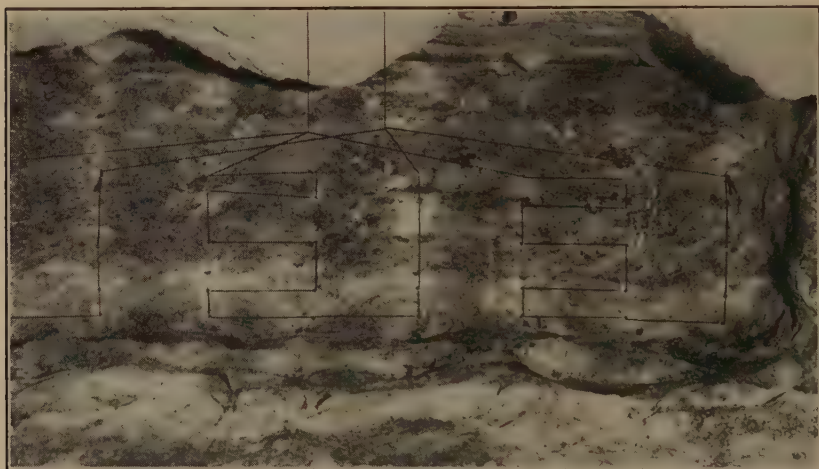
HOOK-UP USED IN FIRING FROM STORAGE BATTERY.
